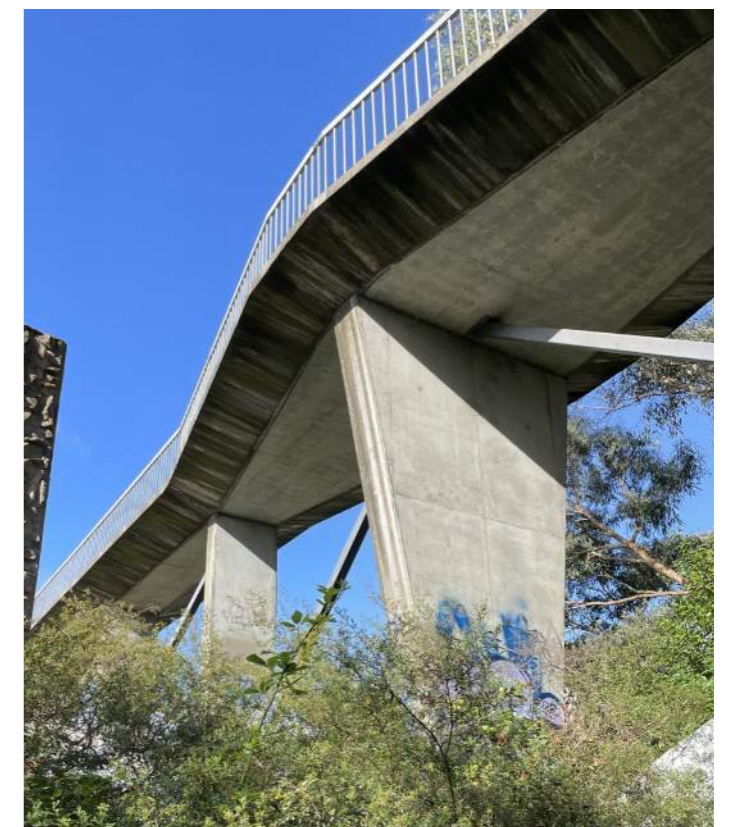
Existing cross-corridor pedestrian bridge at Cabena Street
